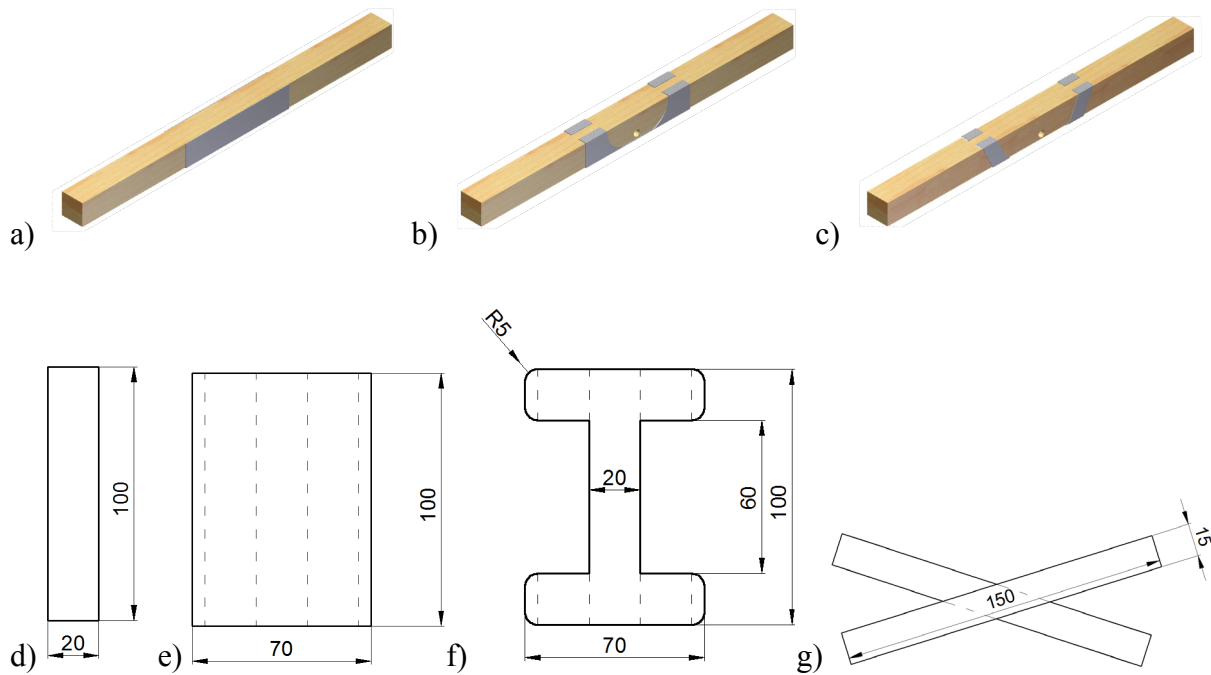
Shapes of local reinforcement and its dimensions, a) U-shape, b) I-shape, c) X-shape, d) flat horizontal reinforcement dimensions, e) U-shape dimensions, f) I-shape dimensions, g) X-shape dimensions
